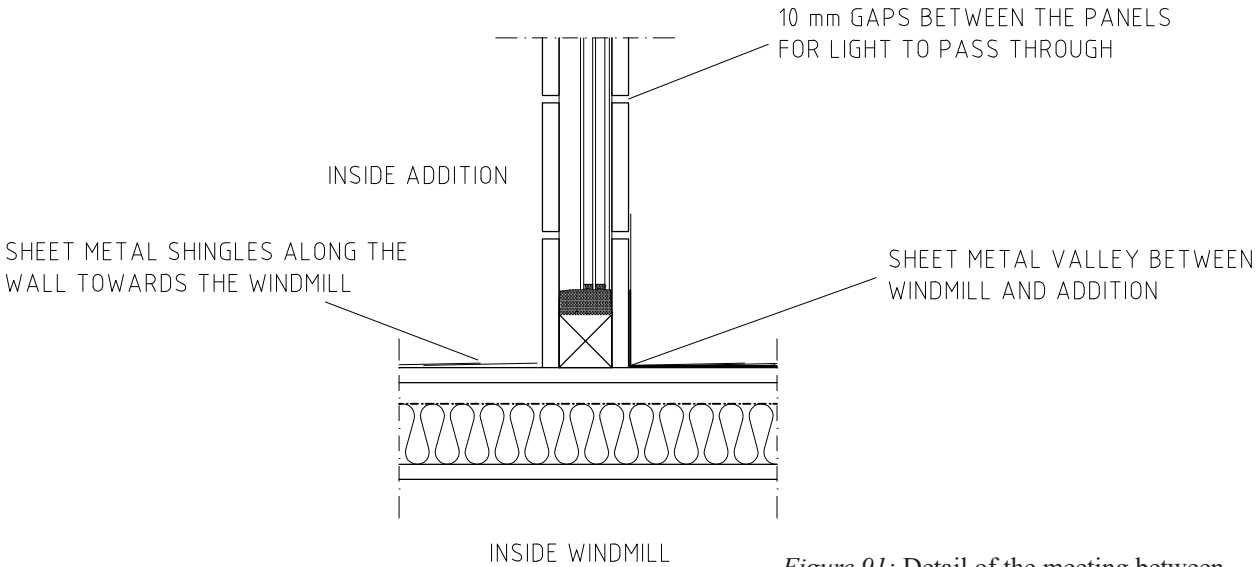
Detail of the meeting between addition and windmill. Scale 1:10.
